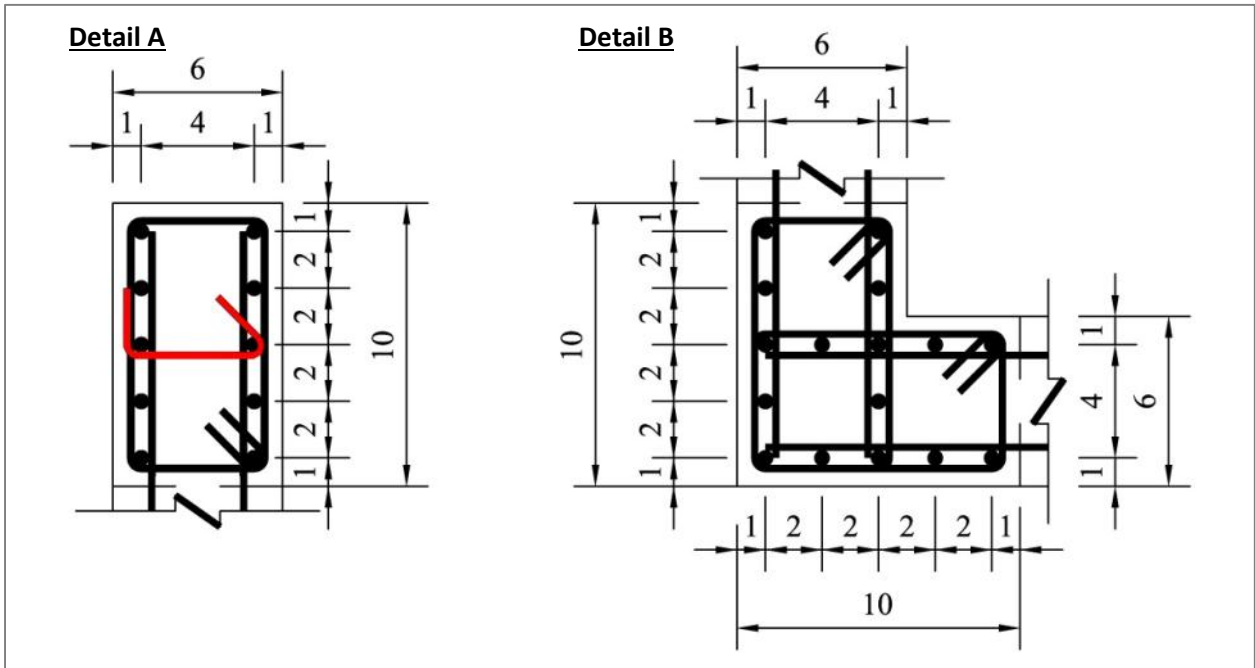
Wall 7/8 boundary element details with hooks (dimensions are provided in inches)
